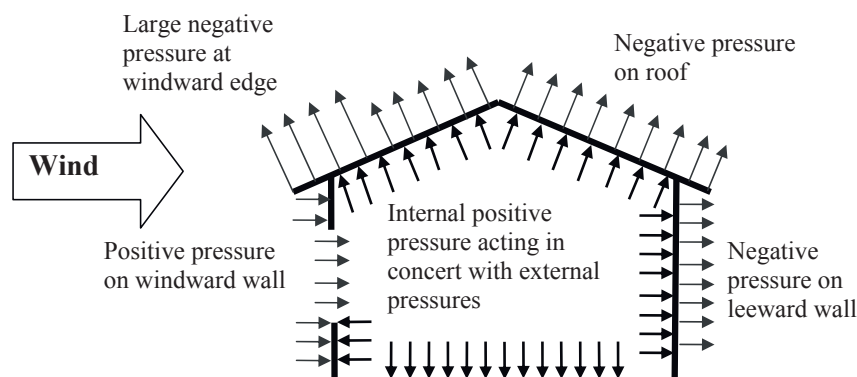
Schematic wind pressure distribution for building with a dominant opening on the windward wall.
